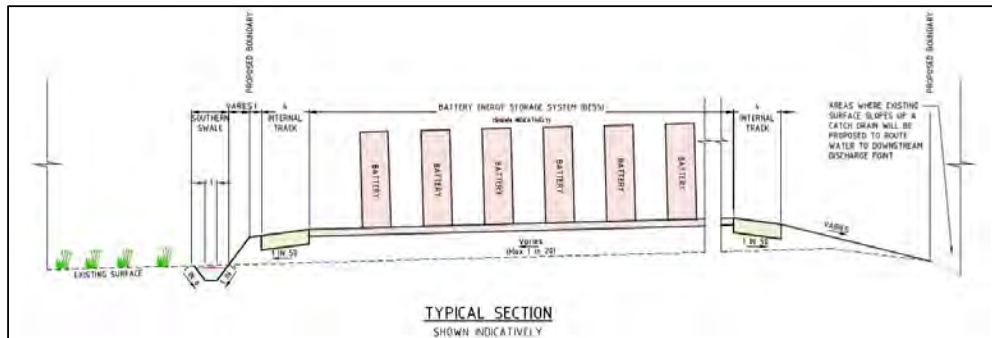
Southern Swale - Indicative Cross-Section [Section A]
